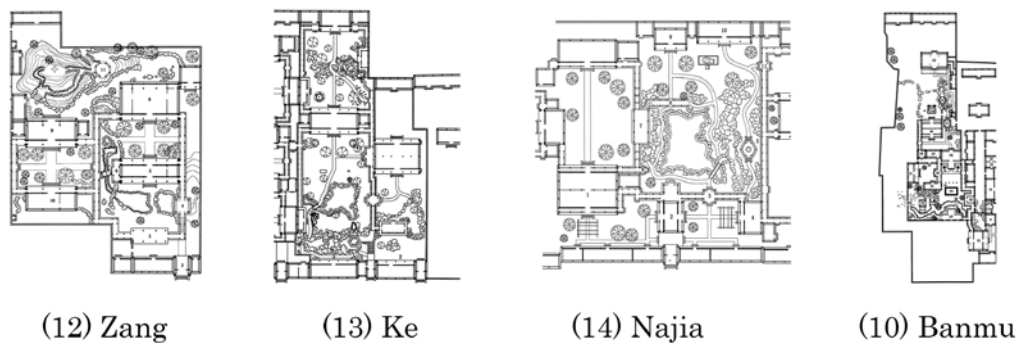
10 Layout of Zang, Ke, Najia and Banmu Garden
